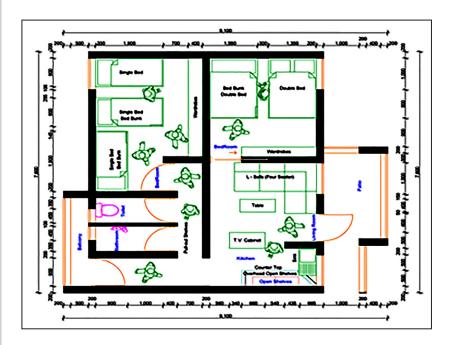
Two-bedroom house floor layout plan option plan three Source: Author's construct 2018
